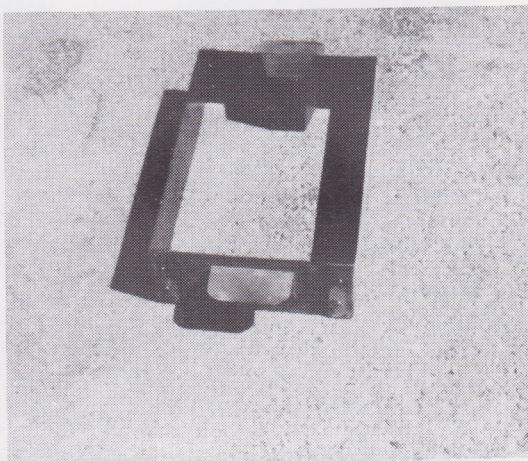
Methods of fixing door and window frames to earth walls.
